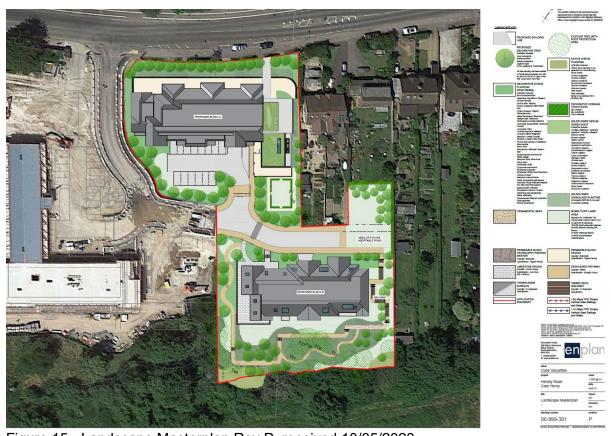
Landscape Masterplan Rev P, received 10/05/2023
